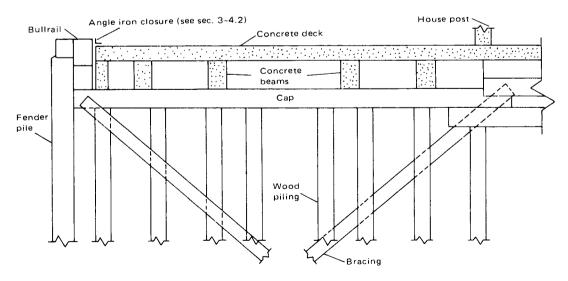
Wharf Substructure with Fire-resistive, Reinforced Concrete Deck and Beams over Combustible Piles and Pile Caps.
